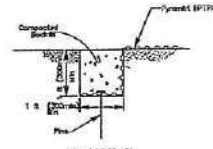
LONGITUDINAL EDGE TRENCH DETAIL
